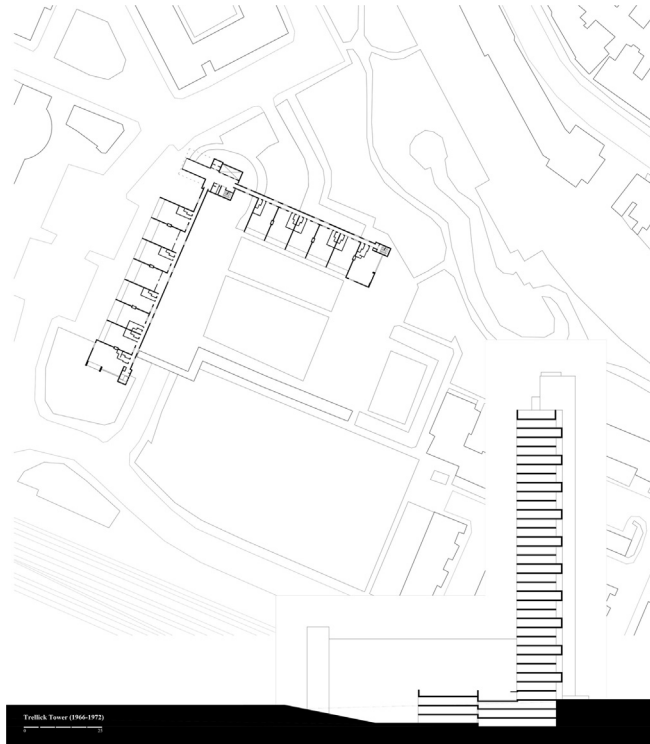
Trellick Tower by Ernő Goldfinger (North Kensington, 1966-1972). Ground floor plan and section. Source: drawing by Gerardo Semprebón.
